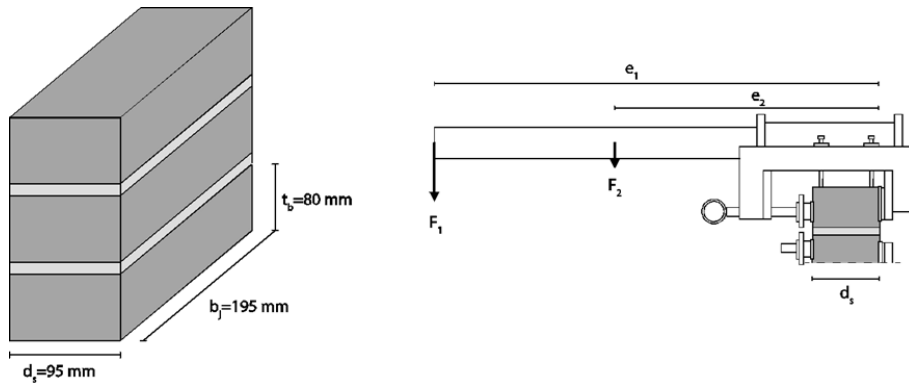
Schematics of concrete unit for bond wrench testing and points of application of F_1 and F_2
